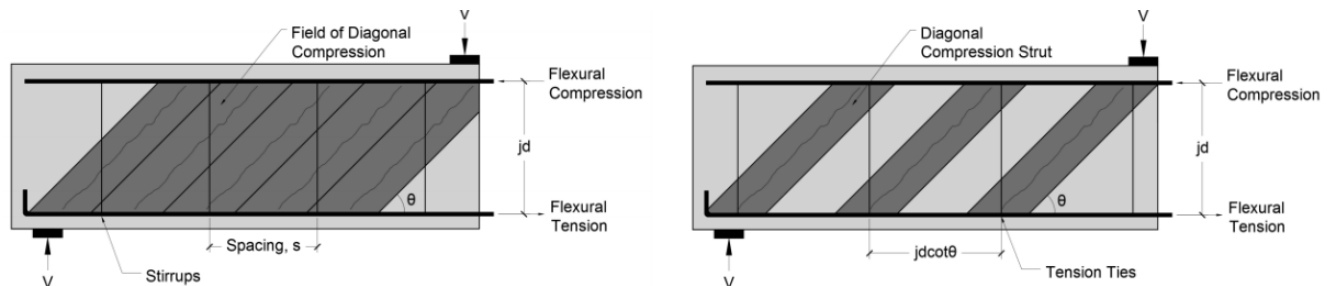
Diagonal stress fields in a cracked reinforced concrete beam (left) and Simplified truss model for concrete members subjected to shear (right)
